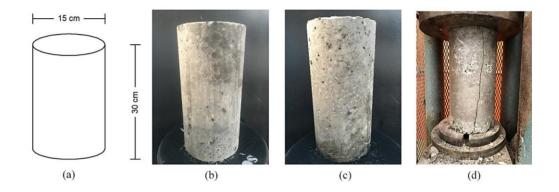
Shape and dimension of tested specimen in compliance with ASTM C129 (a), concrete specimens with W/C = 0.65 (b) and with W/C = 0.45 (c), and failure specimen after loading (d).
